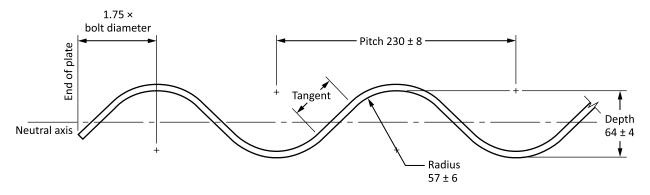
Corrugation profiles for structural plate corrugated, deep corrugated structural plate, and two-flange tunnel liner plate pipe
